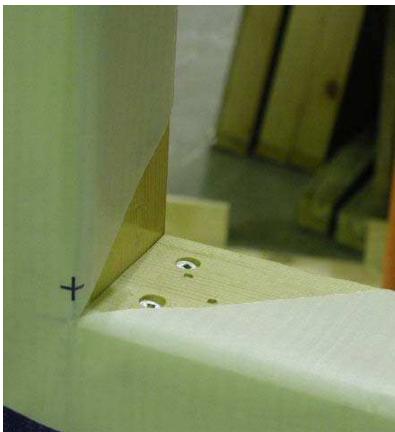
Installation of the polymeric WRB on the specimen No. 14, and deficiency at the corner
